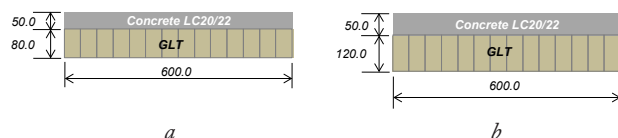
Cross-section of TC1 panels with the length of a) 4.5 m and b) 6.0 m.
